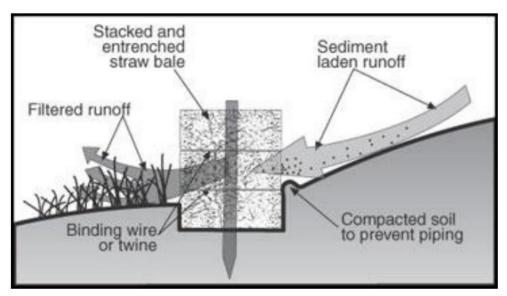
Cross-section of installed hay bale check dam indicating staking and excavation of bales into soil.
